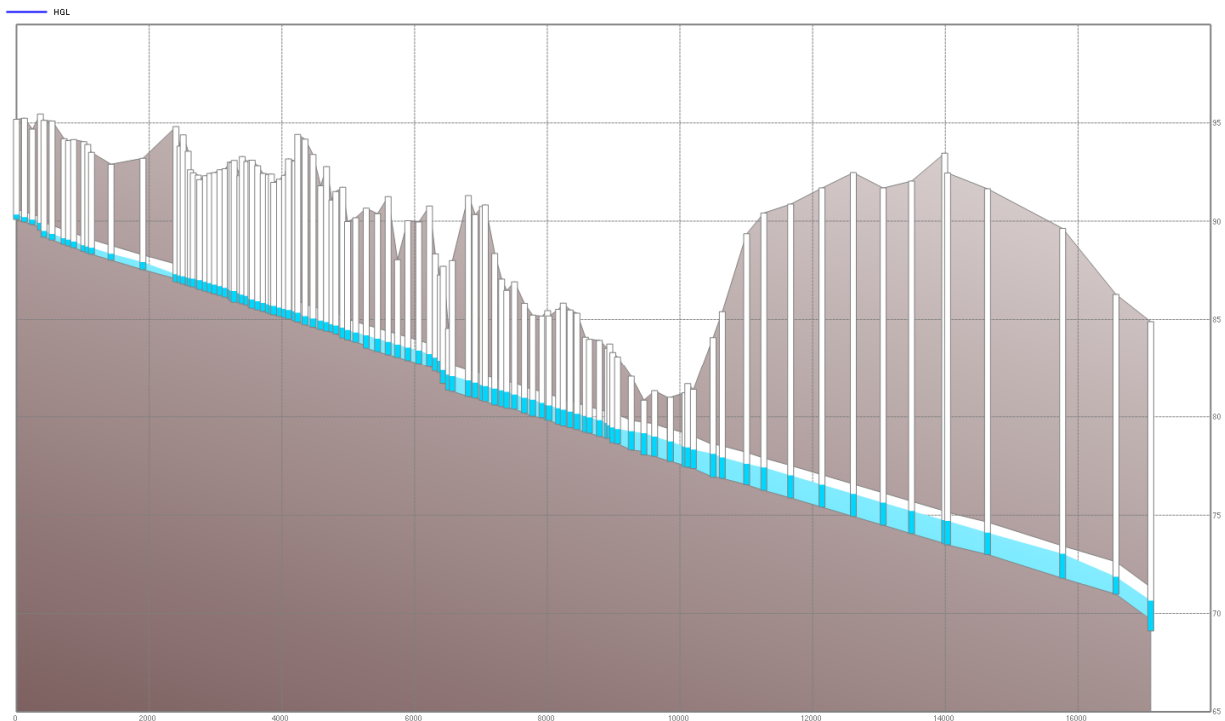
Profile view of South Nepean Collector and West Rideau Trunk under existing conditions
